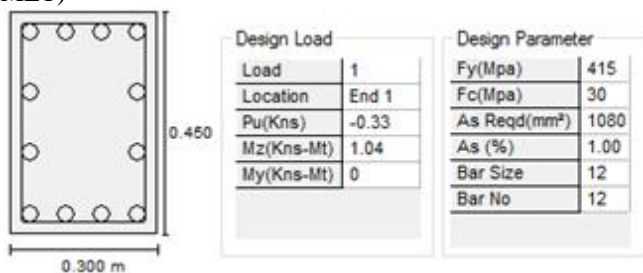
Reinforcement detail of column 20 after application of dampers
